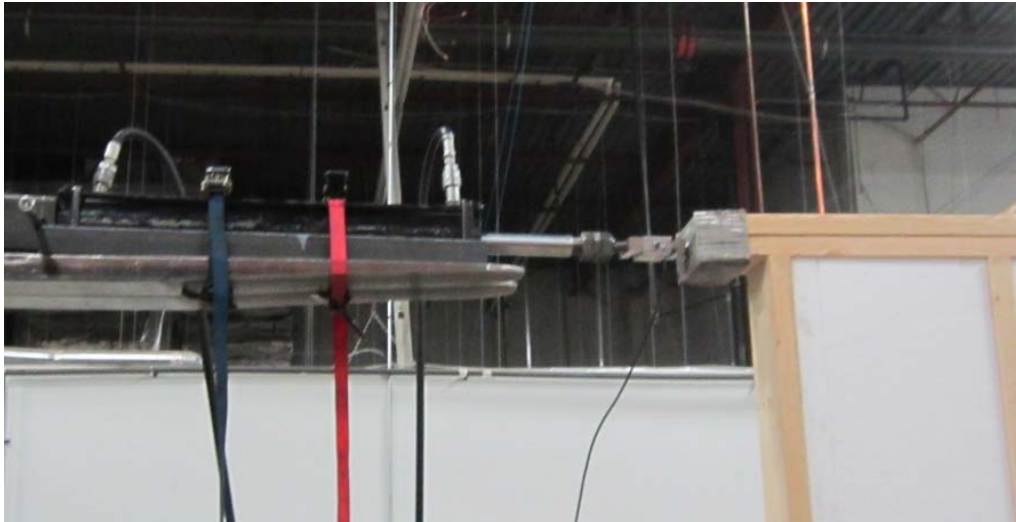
Hydraulic ram and load cell applying horizontal load to test assembly
